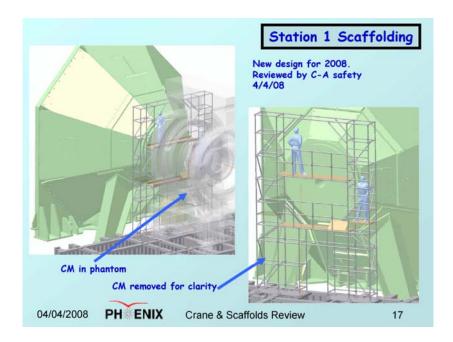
Station 1 Scaffold (Note: pictures are from MuTrigger North installation. South installation is similar)
